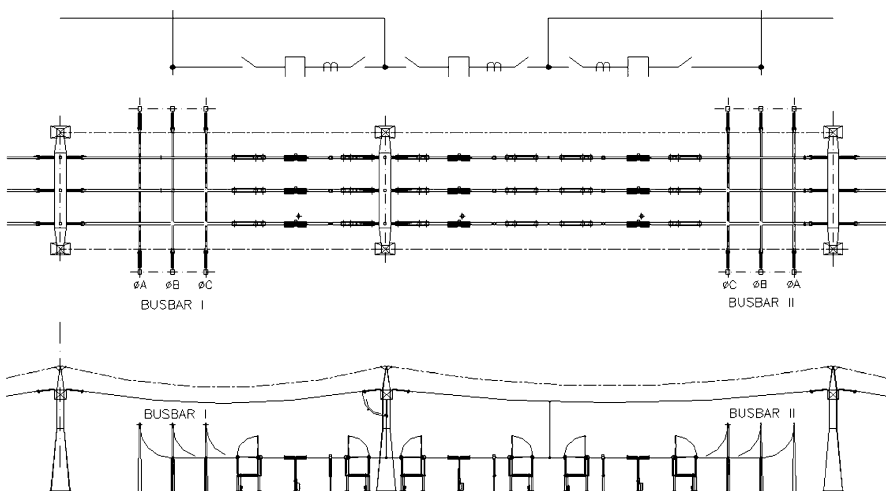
1 1/2 circuit breaker: plan view and elevation
